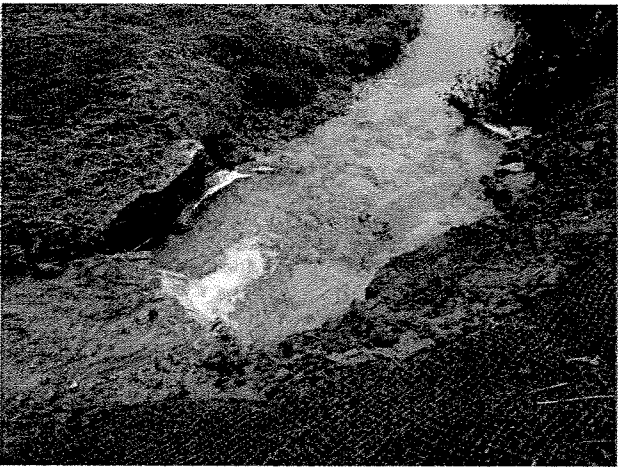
Log vane installed at LT Station 6+57. (4/7/04)
